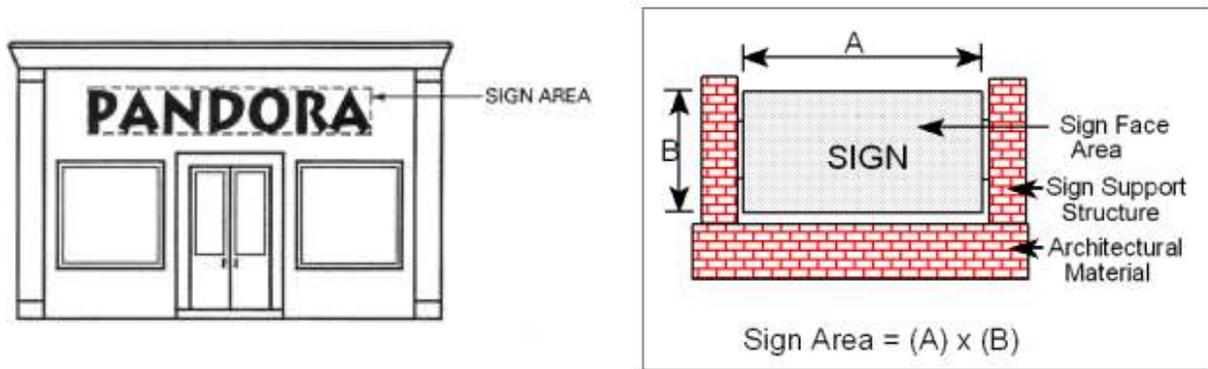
A: Illustration of sign area calculation for a wall sign (left) and a ground sign (right).
